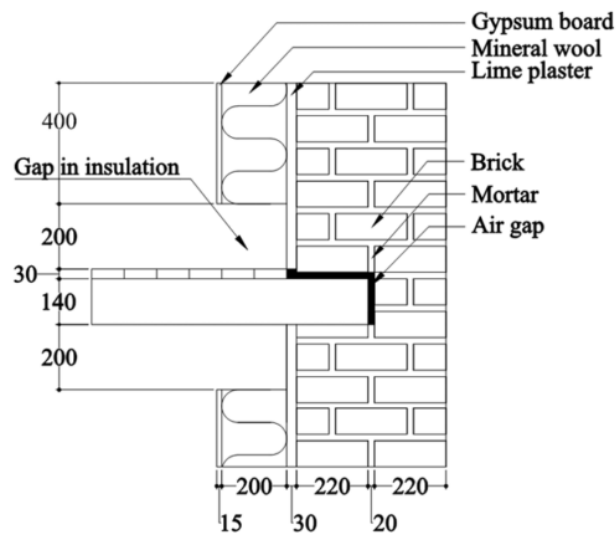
traditional insulation with 200 mm gap above and below floor section[2]
